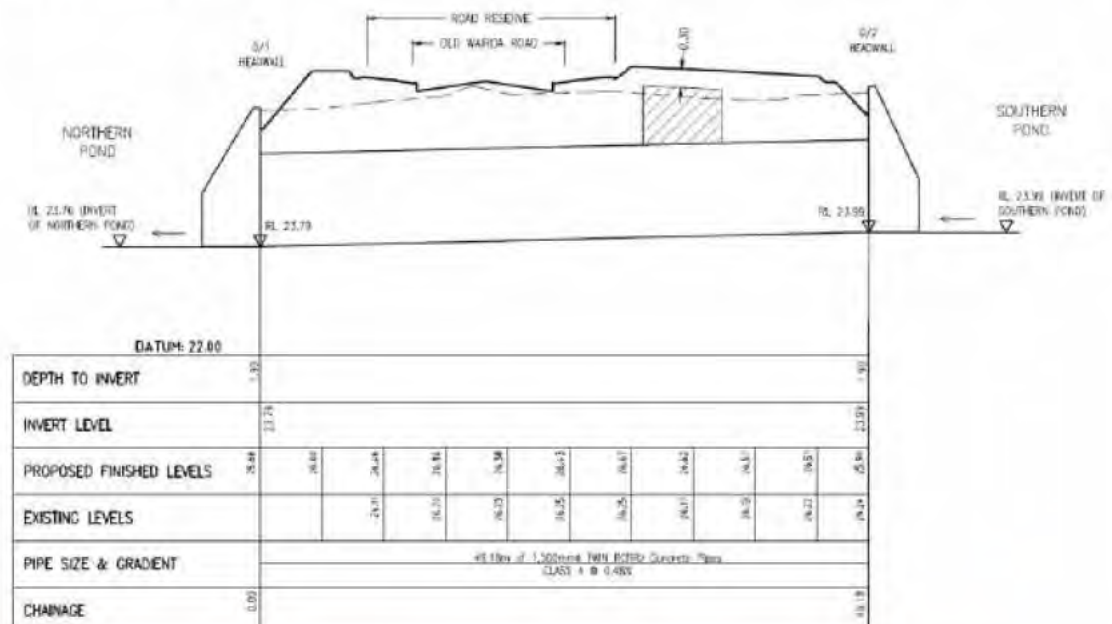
Old Wairoa Road Culvert longsection (MSC, October 2015)
